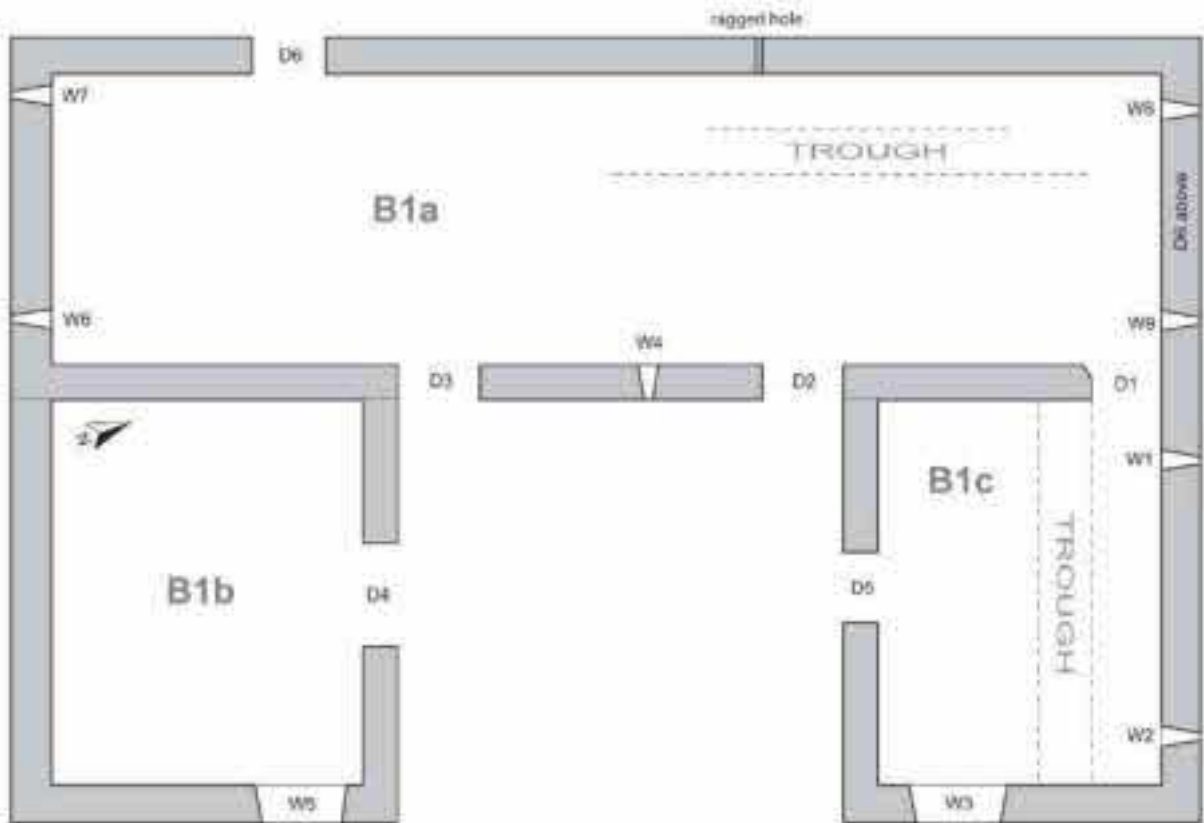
PLAN OF THE BARN (NOT TO SCALE).
